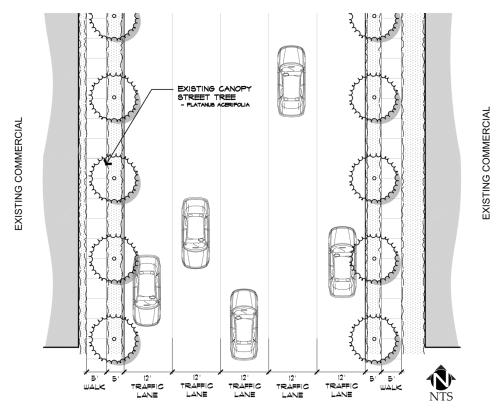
Via Alba - South Section (North of Ontario Center Parkway) Private Streetscape Section and Plan
